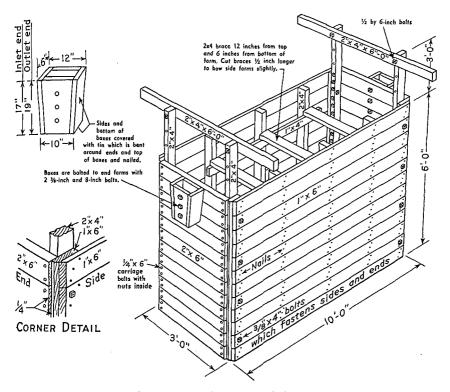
Typical construction details for reuseable septic tank form. Form consists of two end and two side panels fastened at each corner with four 3%-by 4-inch machine bolts. To make side panels nail 1-inch thick boards to 1 by 6's. Bevel ends of side sections, leaving about 1/4 inch of the 1 by 6 edge. To make end panels bolt 2-inch thick boards to 2 by 4's with 1/4-by 6-inch carriage bolts. Set out end panels 1/4 inch from edge of 1 by 6 to facilitate removal. Before assembling form, cover with heavy grease the surfaces of corner pieces where they come together. Make sides, ends, top, and bottom of end boxes of 1 by 6 boards to the approximate dimensions shown.
